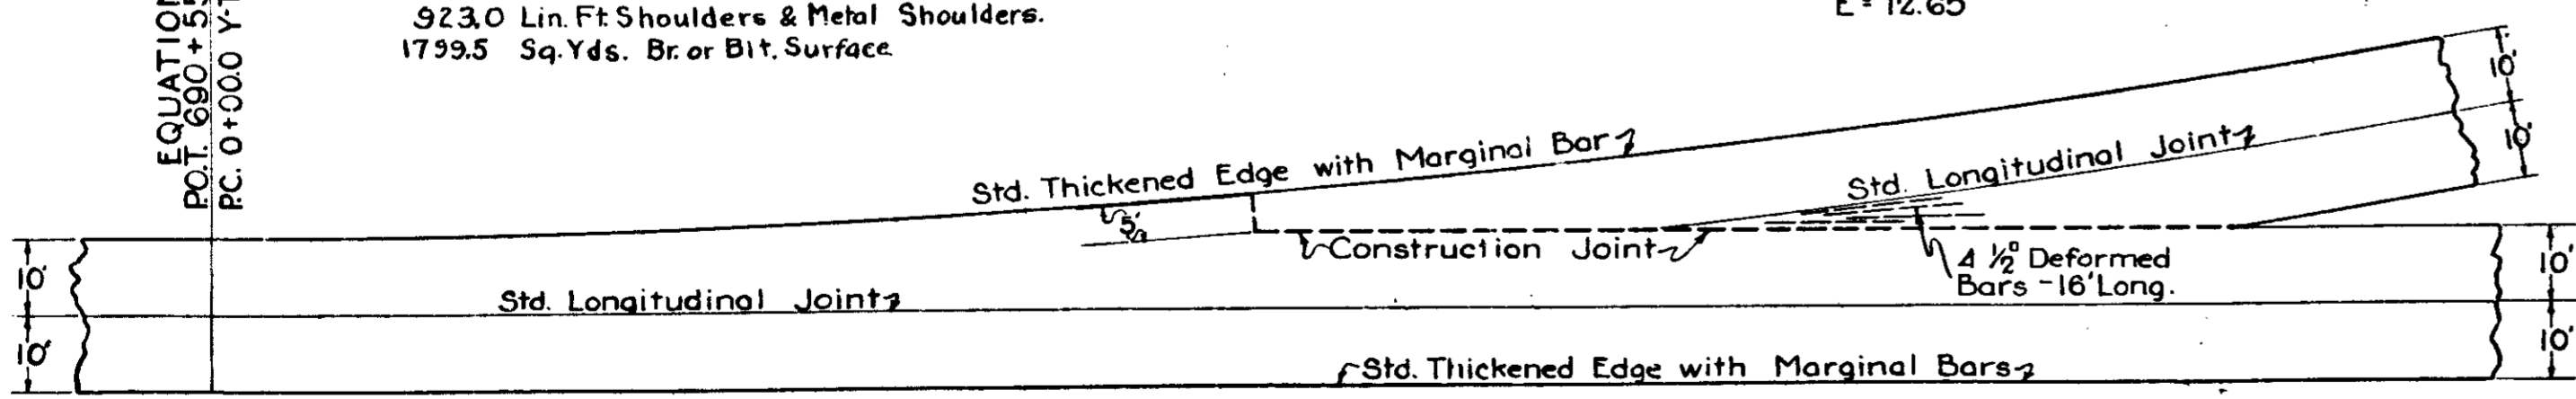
DETAIL OF INTERSECTION TO BE CONSTRUCTED AT STA. 55+00.
